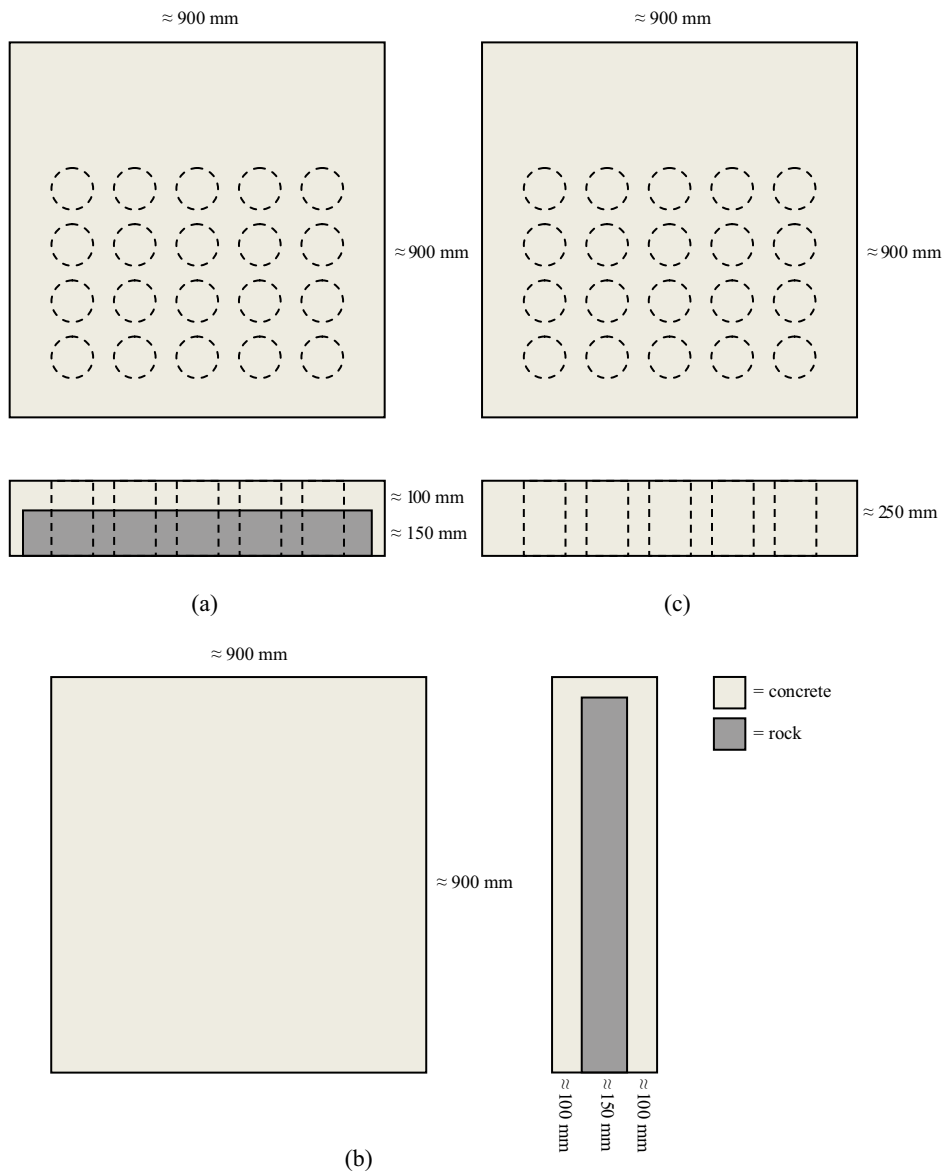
Schematic illustration of a) horizontal rock-concrete block, b) vertical rock-concrete block and c) plain concrete blocks.
